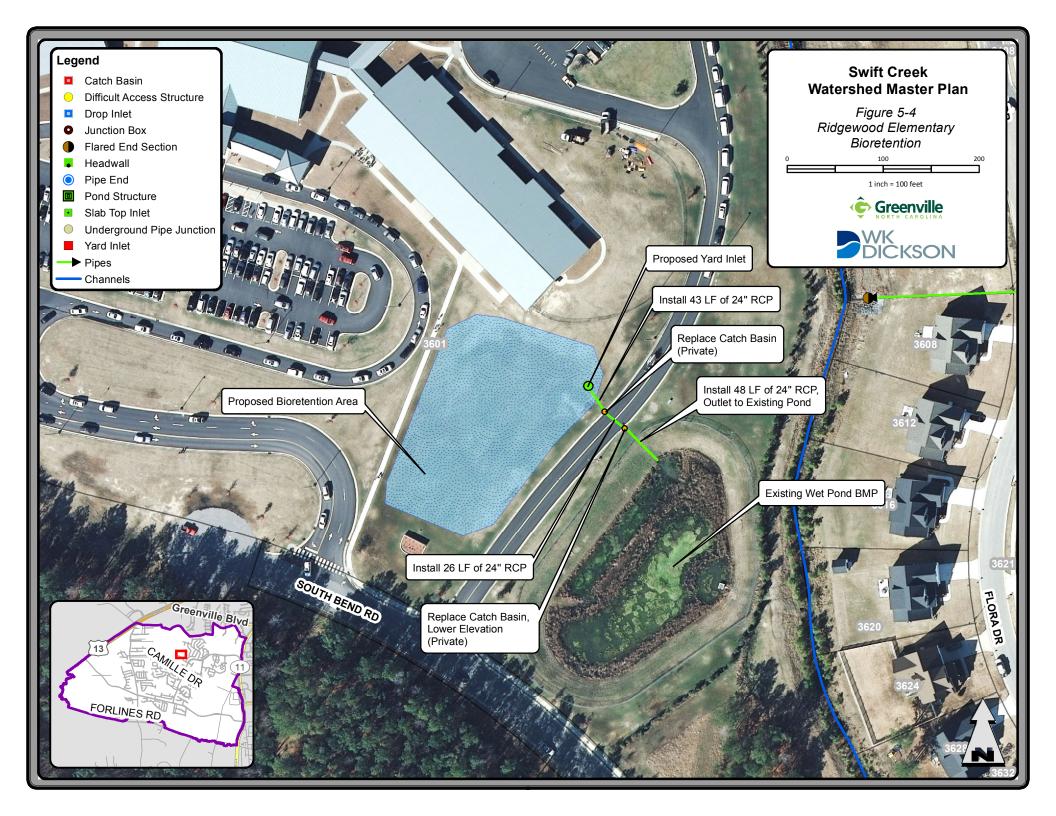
Proposed Location for Ridgewood Elementary Bioretention Area
